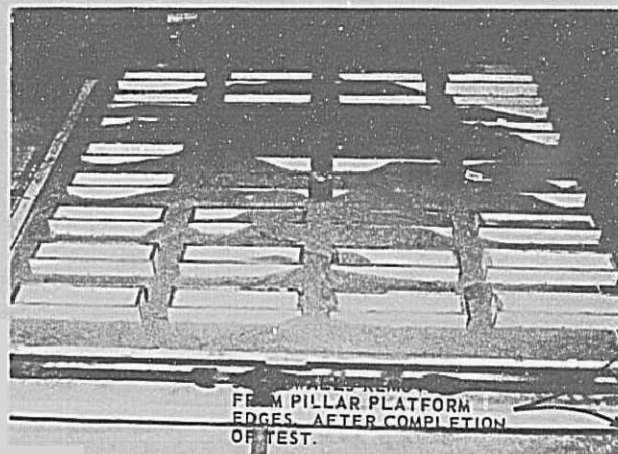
Test 14. Mine cavity was level and the horizontal and vertical geometrical scale 1:24. Slurry concentration was 10 percent. Photo P801-D-73853
